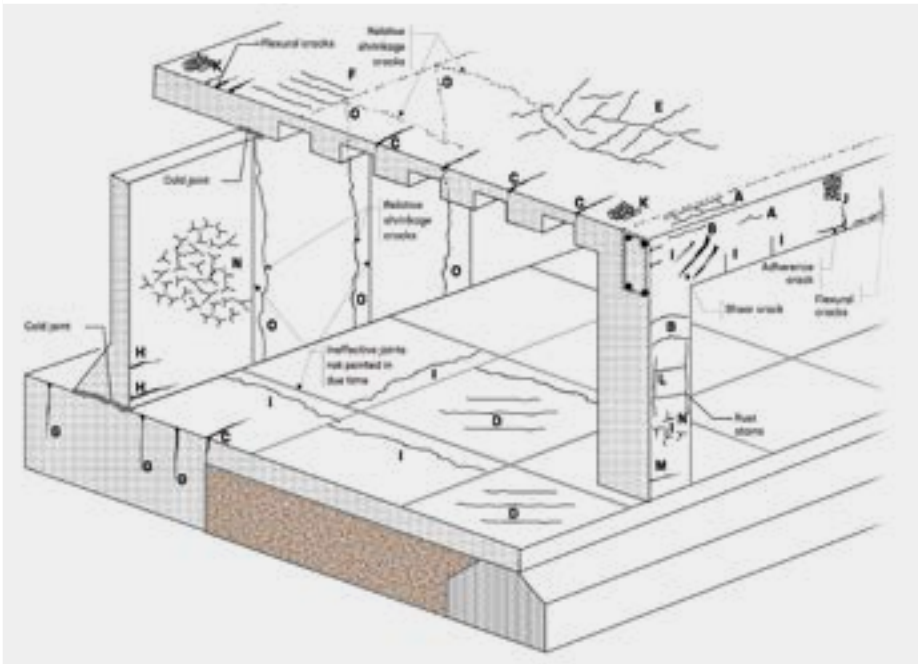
Types of Cracks in Reinforced Concrete Structures
